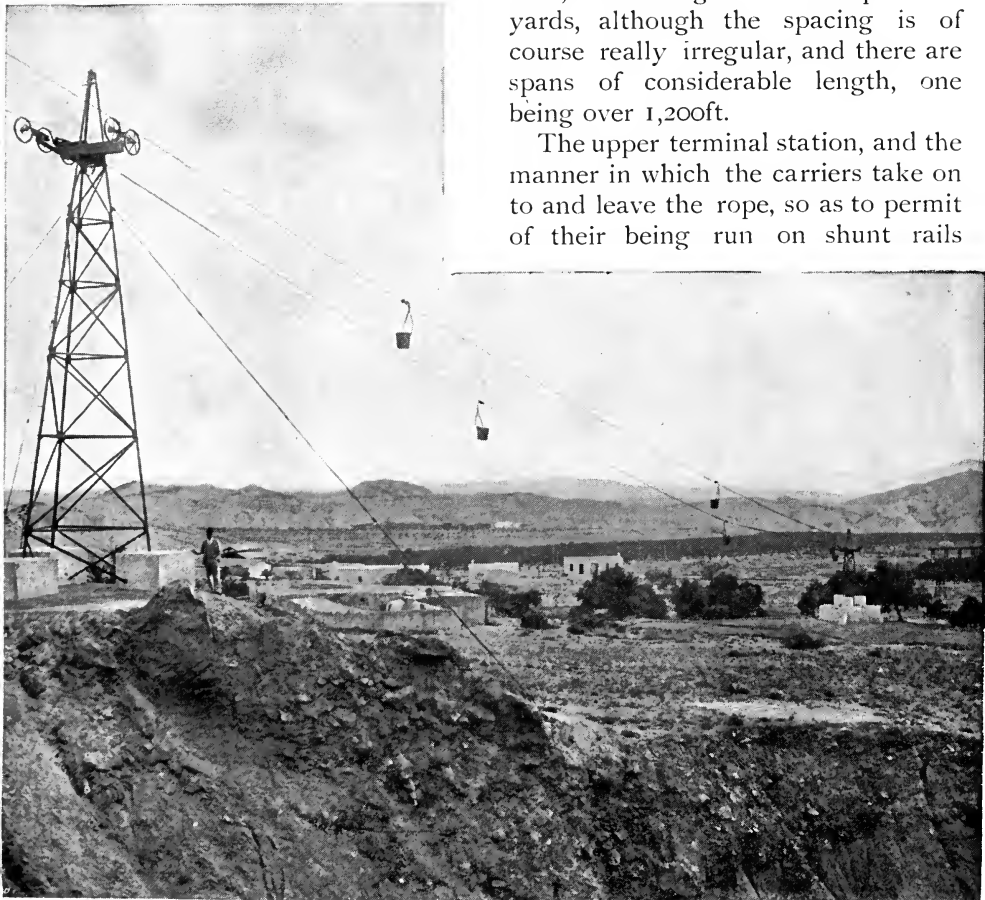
GENERAL VIEW OF PORTION OF ROPEWAY, SHOWING 35-FT. TRESTLE.
